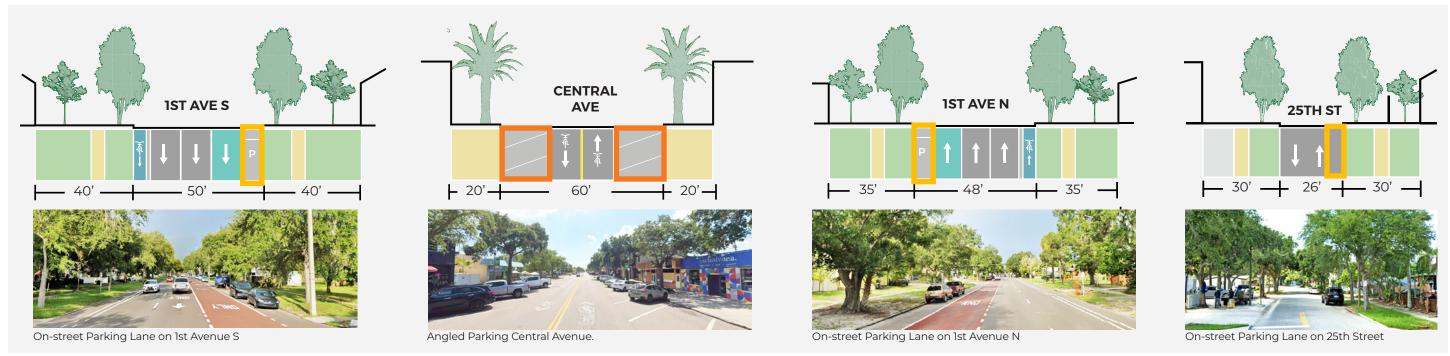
TYPICAL STREET SECTIONS OF PARKING
